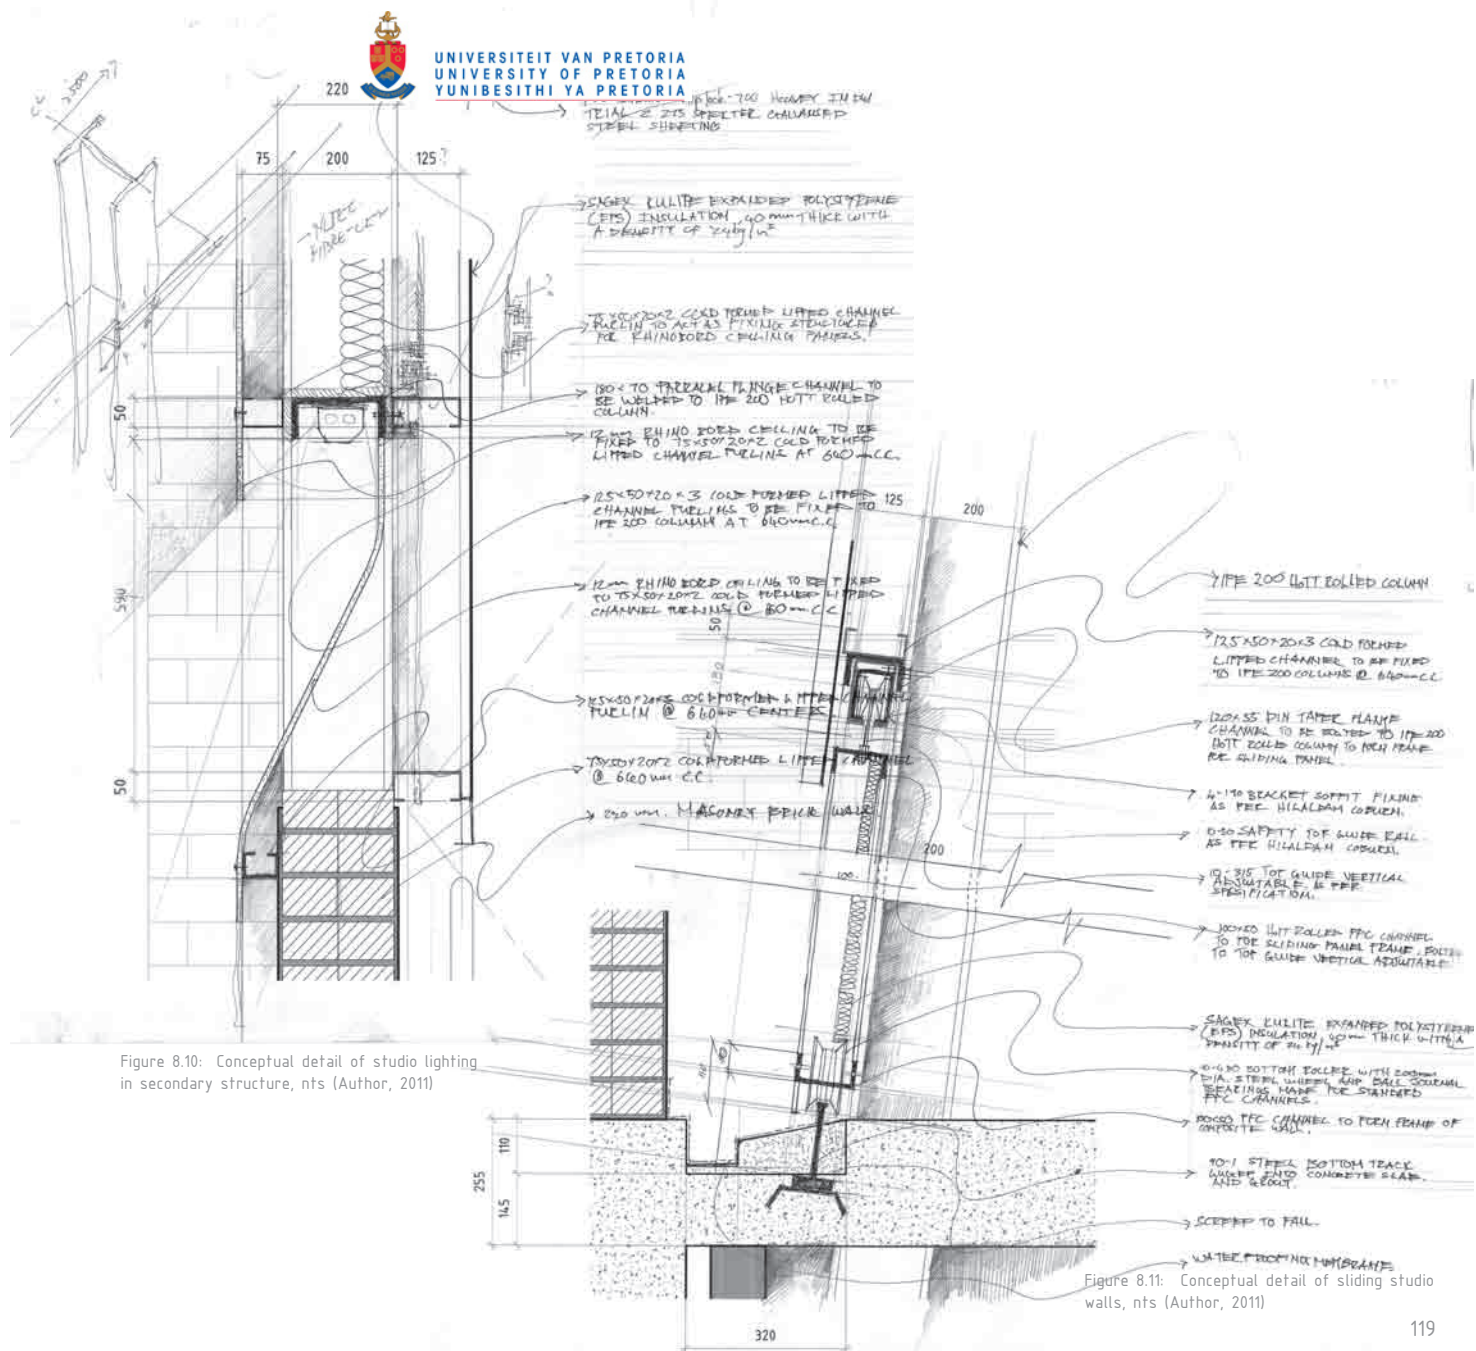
Conceptual detail of studio lighting in secondary structure, nts (Author, 2011)
